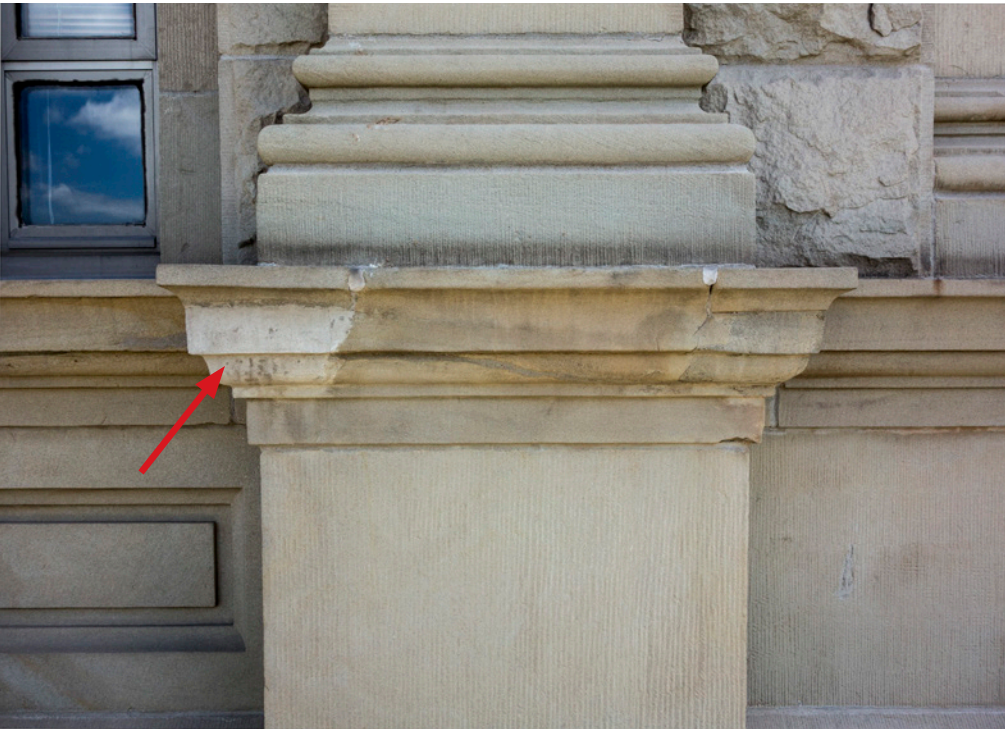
Poor Patch Repair at West Elevation.
